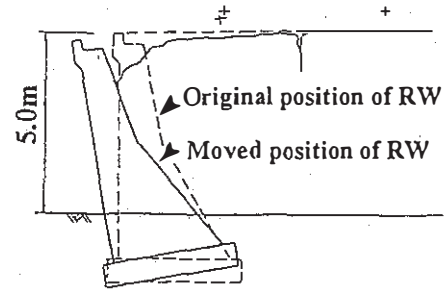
Cross-section of the seriously damaged gravity type unreinforced concrete RW at Ishiyagawa Station (GT1 in Fig. 4), Hanshin Railway Main Line.
